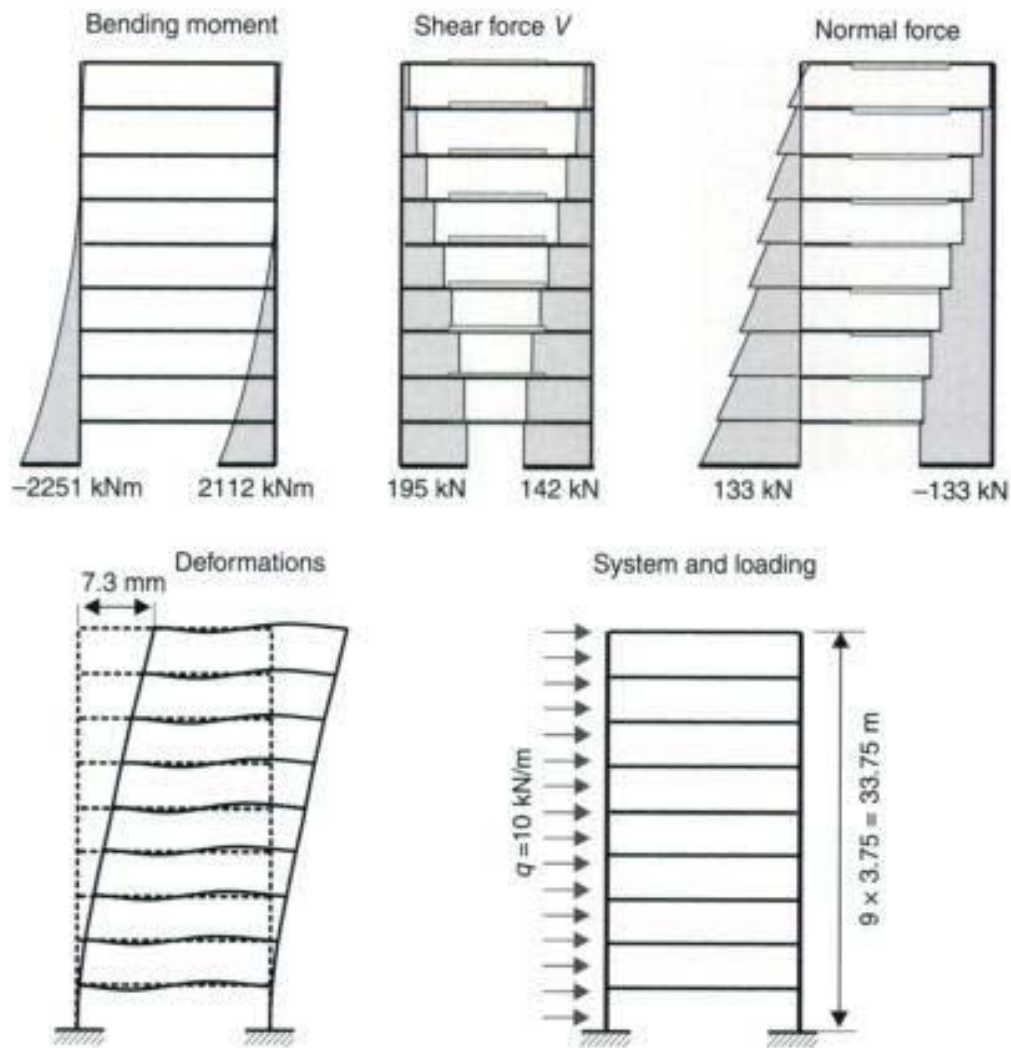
Member forces and deformation of a shear wall with large openings, nodes at the column/beam joints coupled
